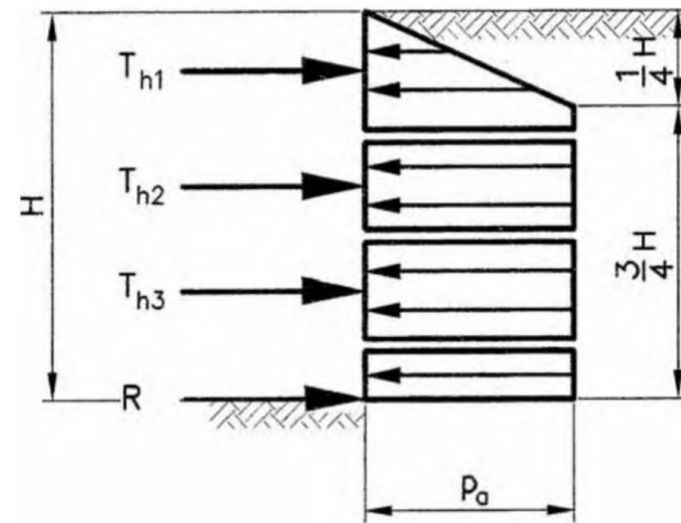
1—Apparent Earth Pressure Distribution for Anchored Walls Constructed from the Top Down in Soft to Medium Stiff Cohesive Soils
